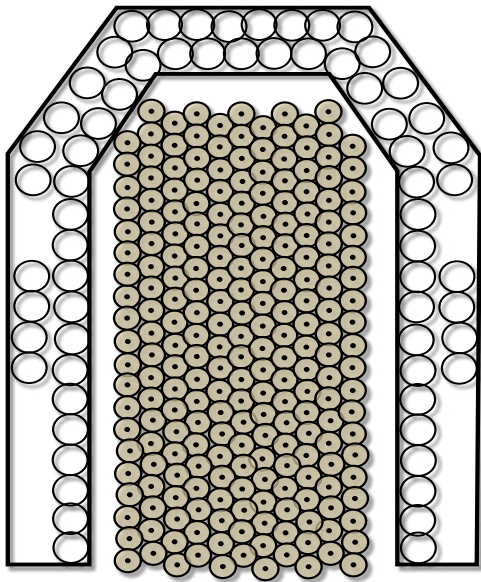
Lay-out of Jet Grouting columns forming the direct foundation.
